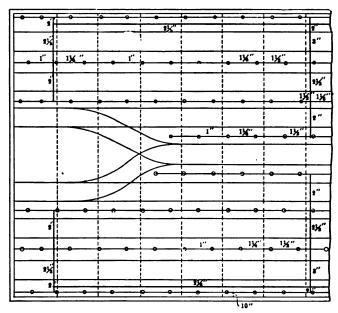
Plan Showing Arrangement of Side Line Sprinklers, North
